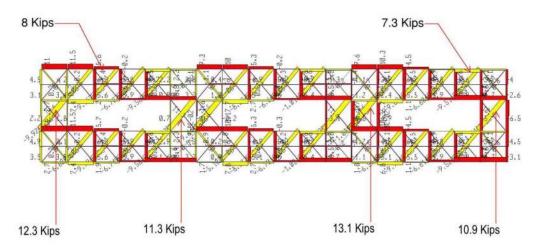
Case 4, 24-story braced frame with x-rod braced structural cladding. Elevation diagram of typical floor (Level 16) showing stresses under wind load. (HOK).
